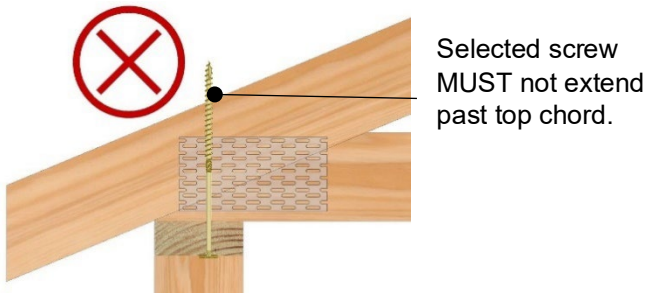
Truss heel with roof pitch between 22.5 – 35 degrees on 90 x 45mm top plate.
